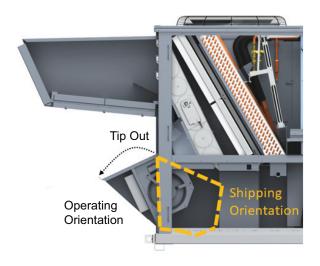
Exhaust/Relief Shipping and Operating Locations
